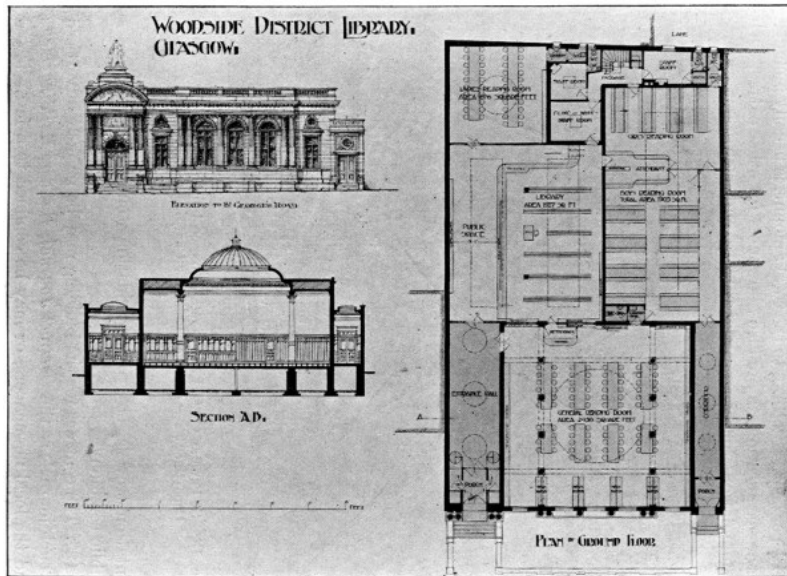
Glasgow Branch Library, Plan and Elevation (Section 122).
